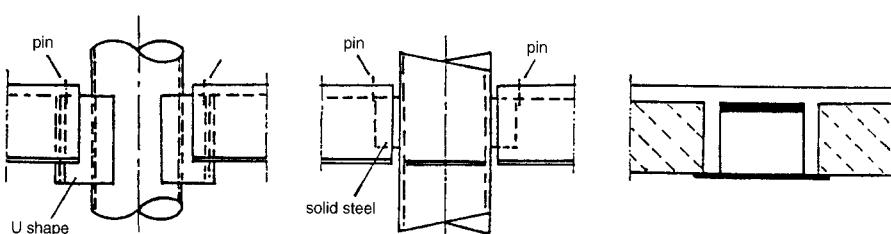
Simple support for top hat beams to CHS and RHS columns
